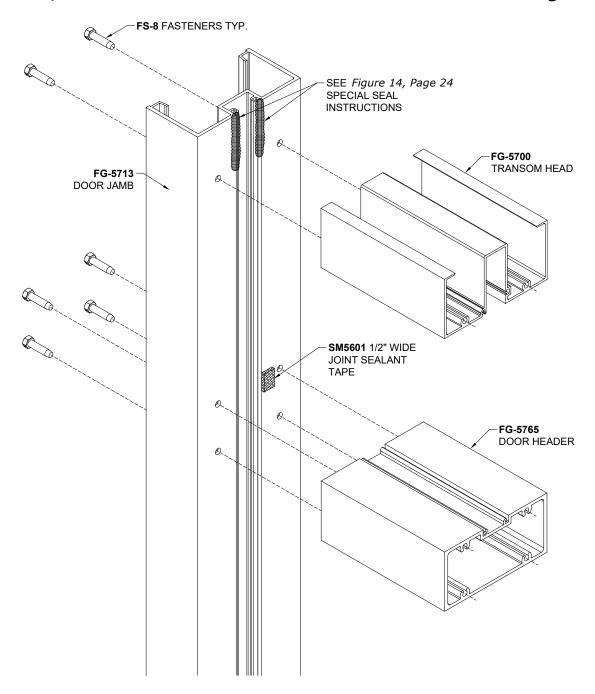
FG-5700 StormMax® Door Frame Assembly Option 2
